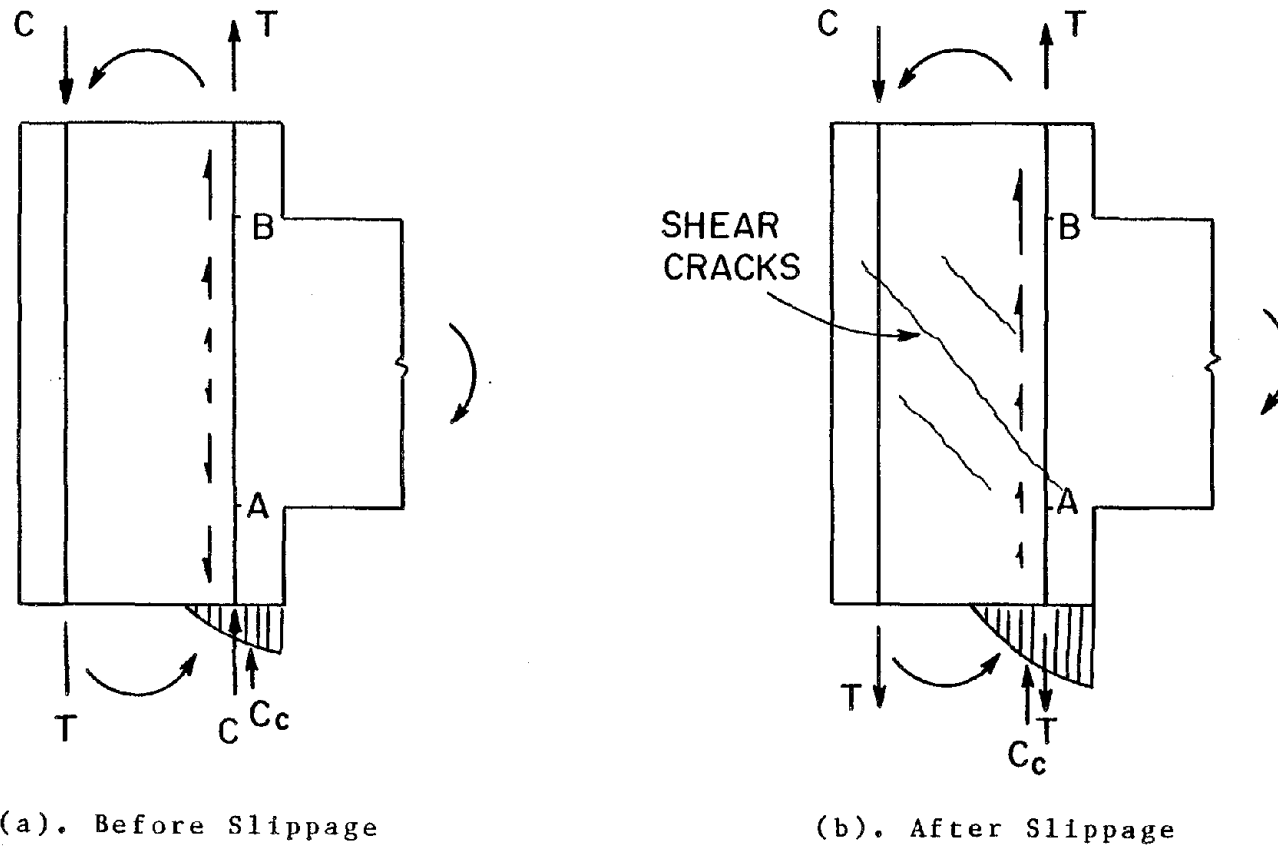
Mechanism of Slippage of Column Longitudinal Reinforcement Through the Joint.
